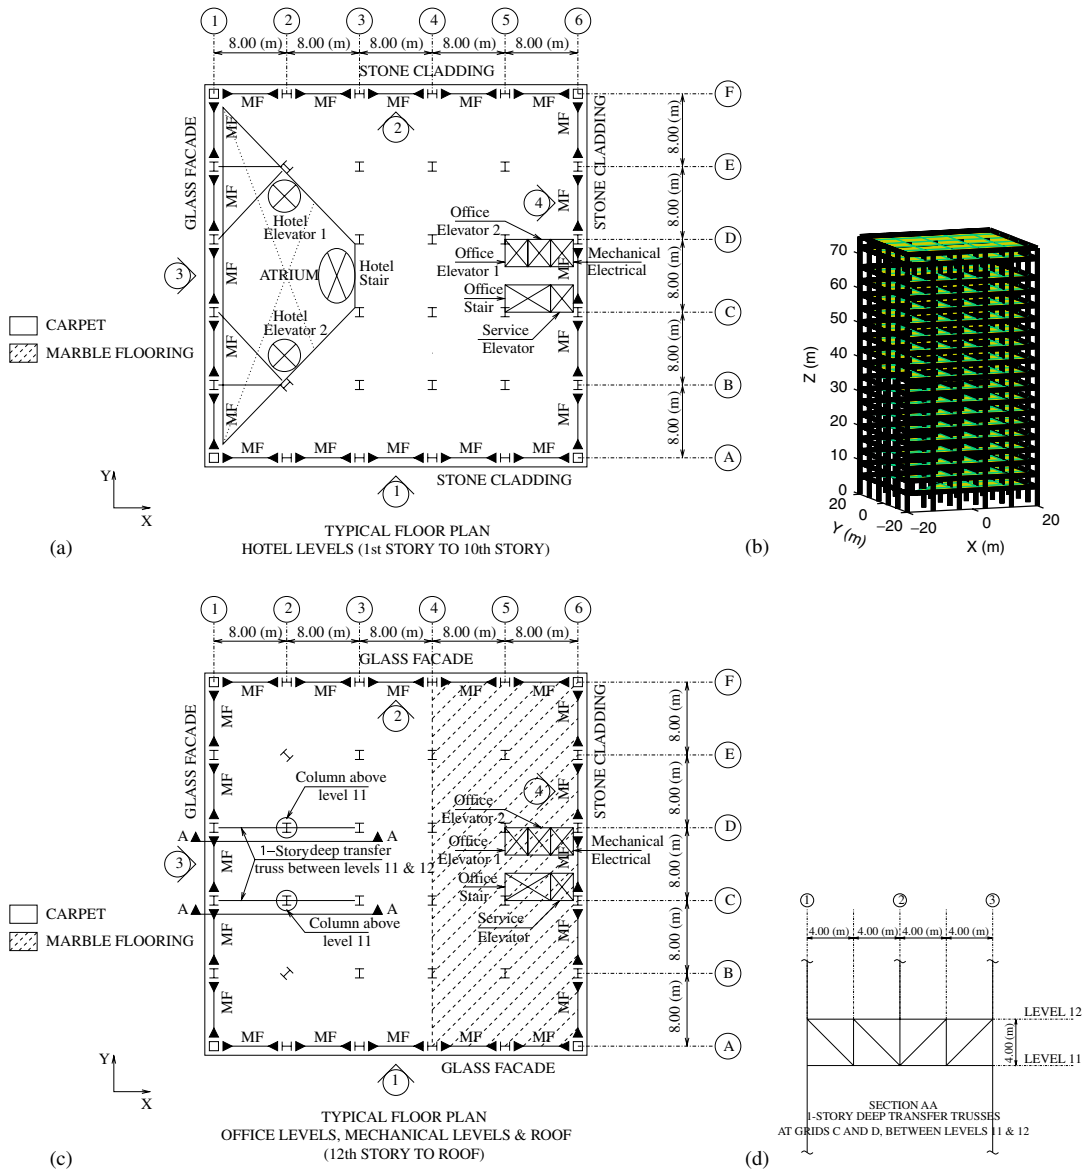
(a) Typical plan of hotel floors in building B-4; (b) isometric view of building B-4; (c) typical plan of office floors in building B-4; and (d) elevation of transfer truss in building B-4.
